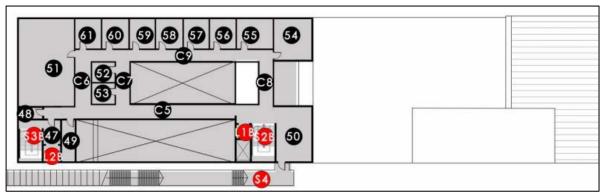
Re-drawn third floor plan (Source: CREW - Cremonesi Workshop (2015)).
